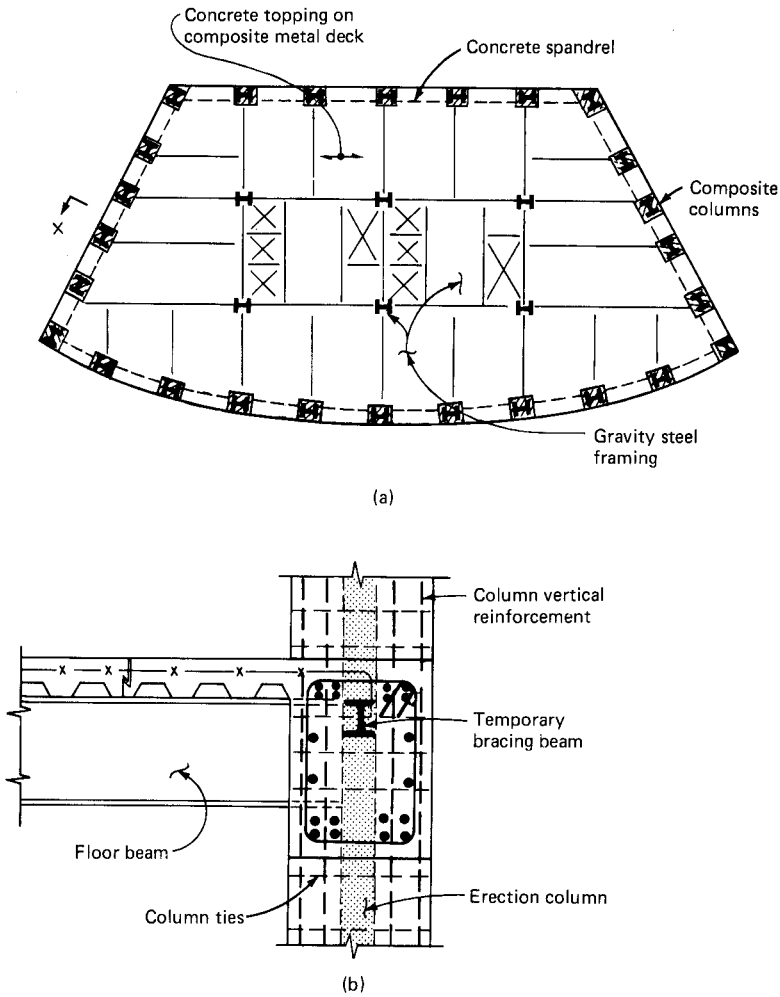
Composite tube with concrete spandrels. (a) Typical floor plan; (b) typical exterior cross section.
